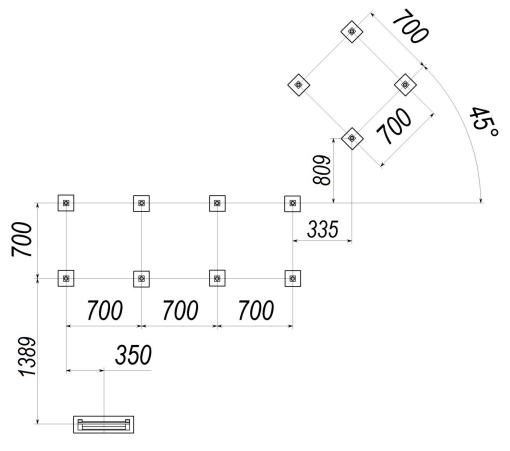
Completeness and assembly scheme of the rope assembly to the complex TL103
